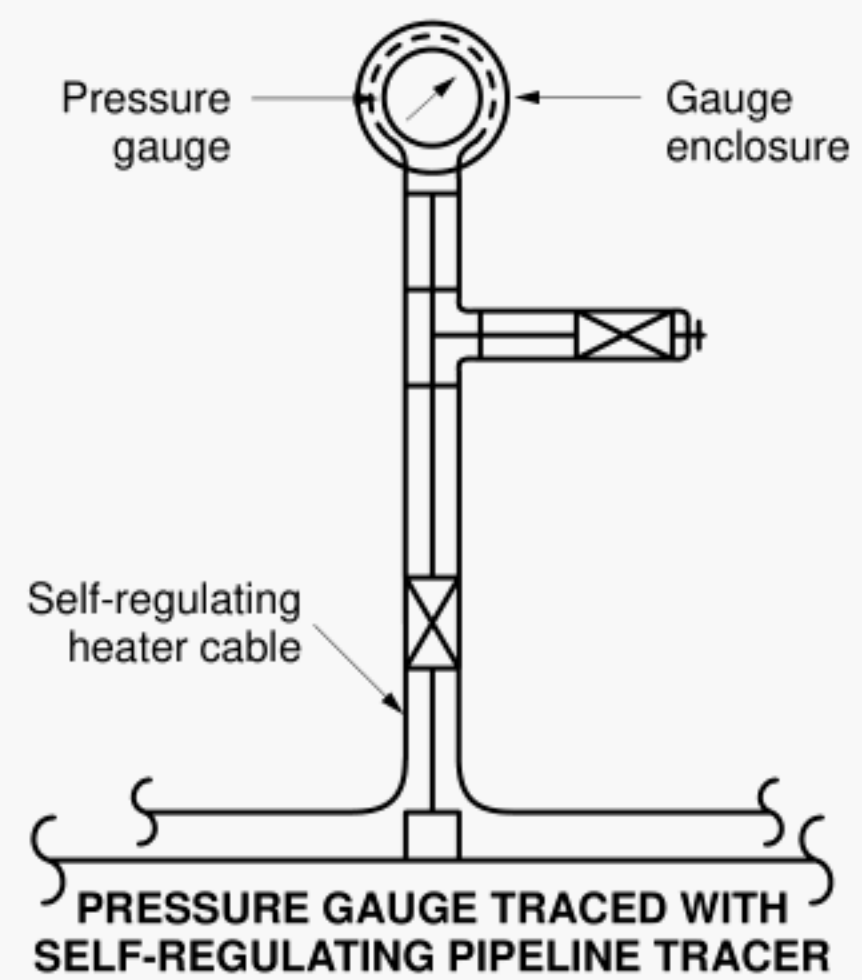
Typical Electrical Tracing and Instrument Enclosures
